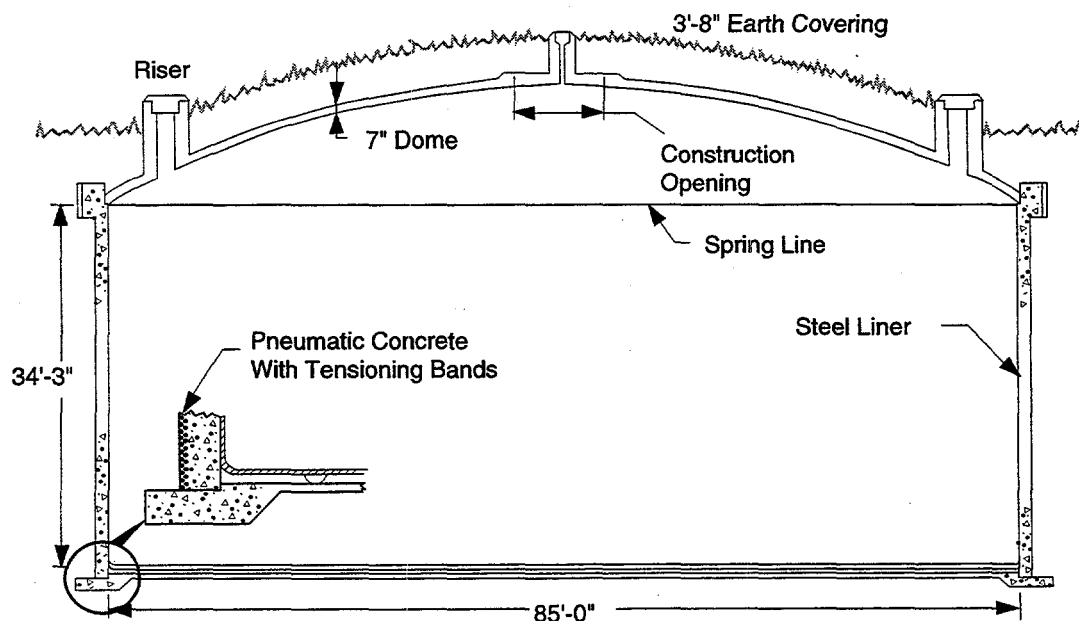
Uncooled Waste Storage Tank, Type IV (Prestressed Concrete Walls, 1,300,000 Gallons).
